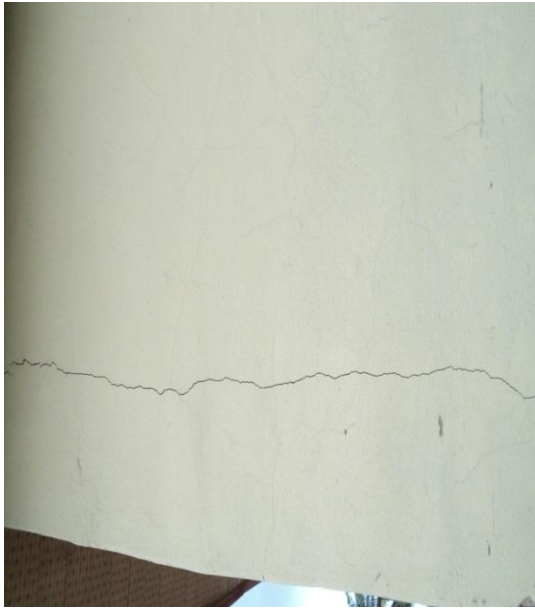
Vertical Crack on the wall at the PCR Laboratory Building at NAUTH, Nnewi.
